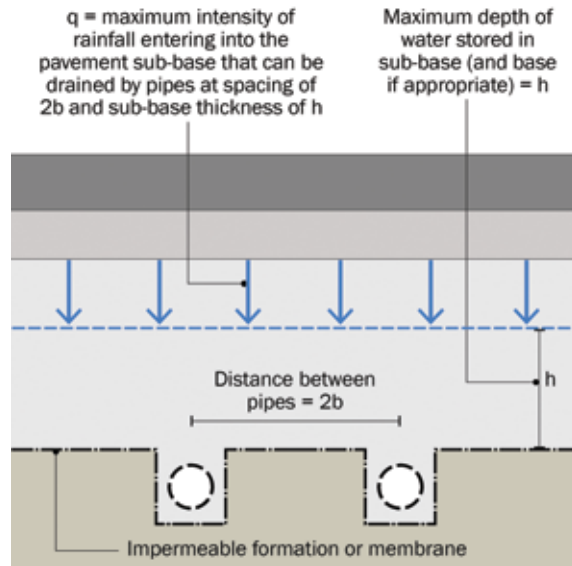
Outfall pipe spacing (after Interpave, 2010)
